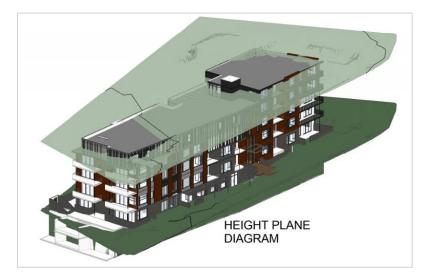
Height plan image with green plan demonstrating that most of the proposed envelope is below the 15.5m maximum height (Source: Robertson + Marks)
